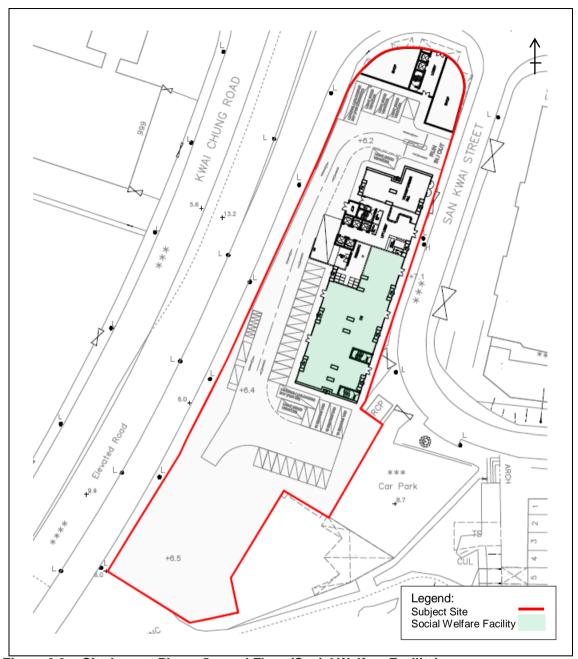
Site Layout Plan – Ground Floor (Social Welfare Facility)
